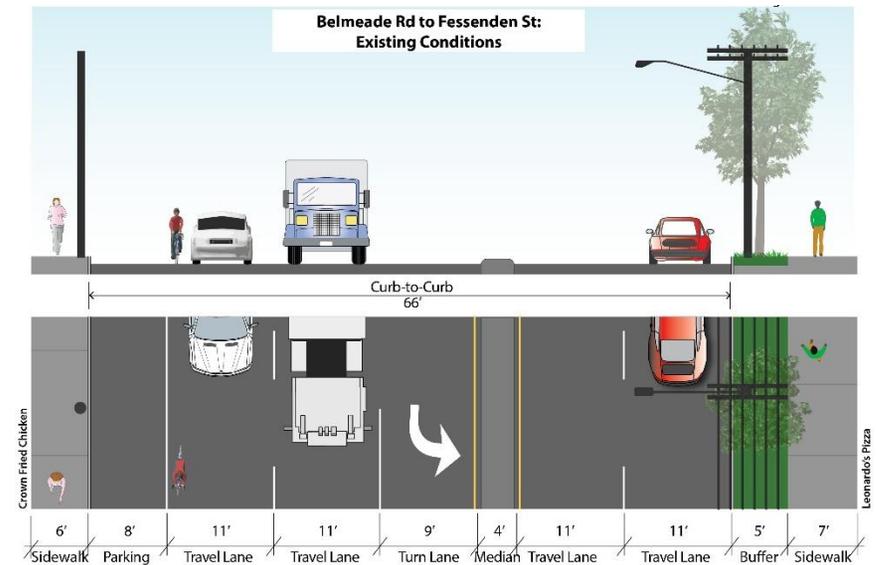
Existing Layout – Forest Avenue from Fessenden Street to Belmeade Road
